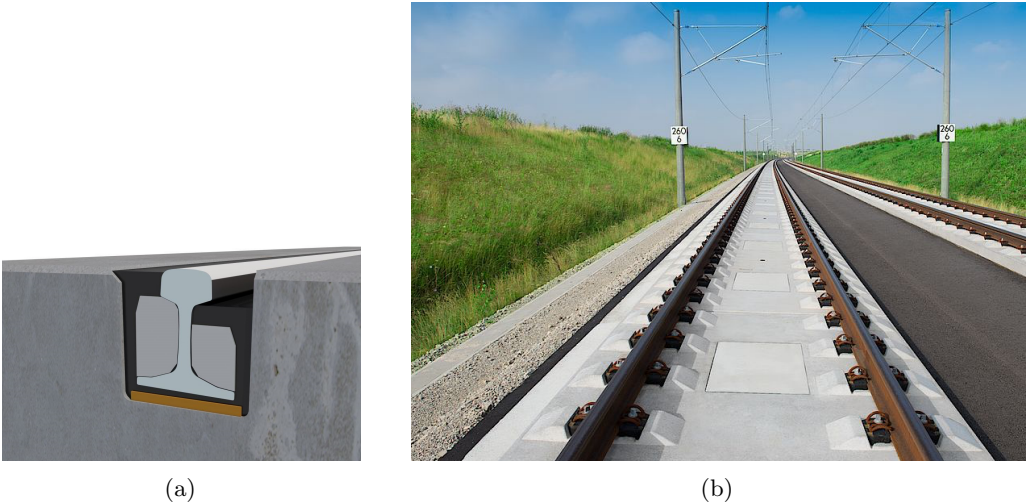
Different types of slab track. (a) A sketch of a continuously supported, embedded rail (from [29]). (b) A slab track system with discrete rail supports without sleepers and pre-fabricated slabs called Slab Track Austria (from [30])
